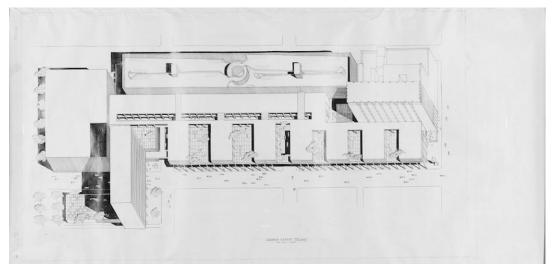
Early planning scheme drawn by Paul Rudolph in 1958, showing garage sited to the north of its final location, with a single central spiral ramp; department stores at the north and south ends of the site; and offices with garden terraces above shops along the Church Street side. Drawing: graphite and adhesive shading film on paper; 74 x 140 cm. (approximately 30 x 54 inches) Library of Congress Online Catalog.
